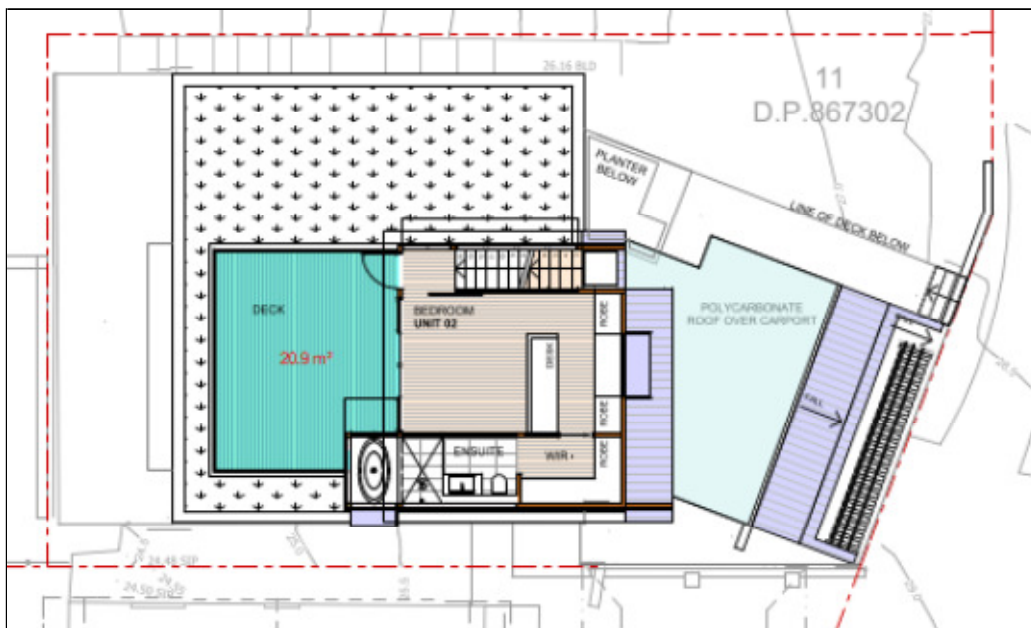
Carport roof identified on Second Floor Landscape Plan - LP04 Issue J (Source: mm+j architects)
